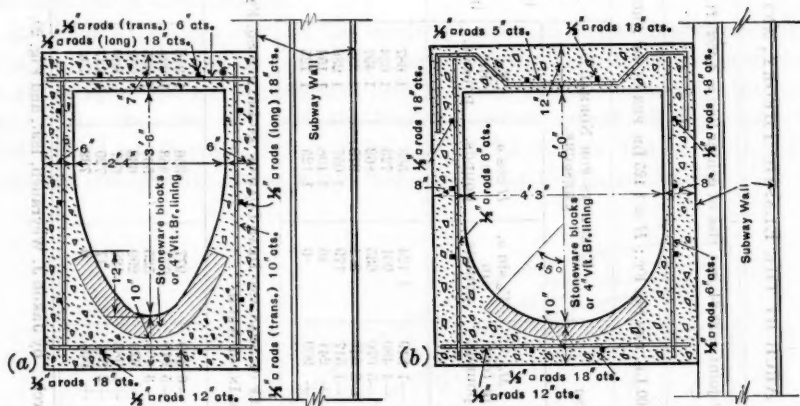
TYPICAL SECTIONS FOR SEWERS ALONG NEW YORK SUBWAYS.
